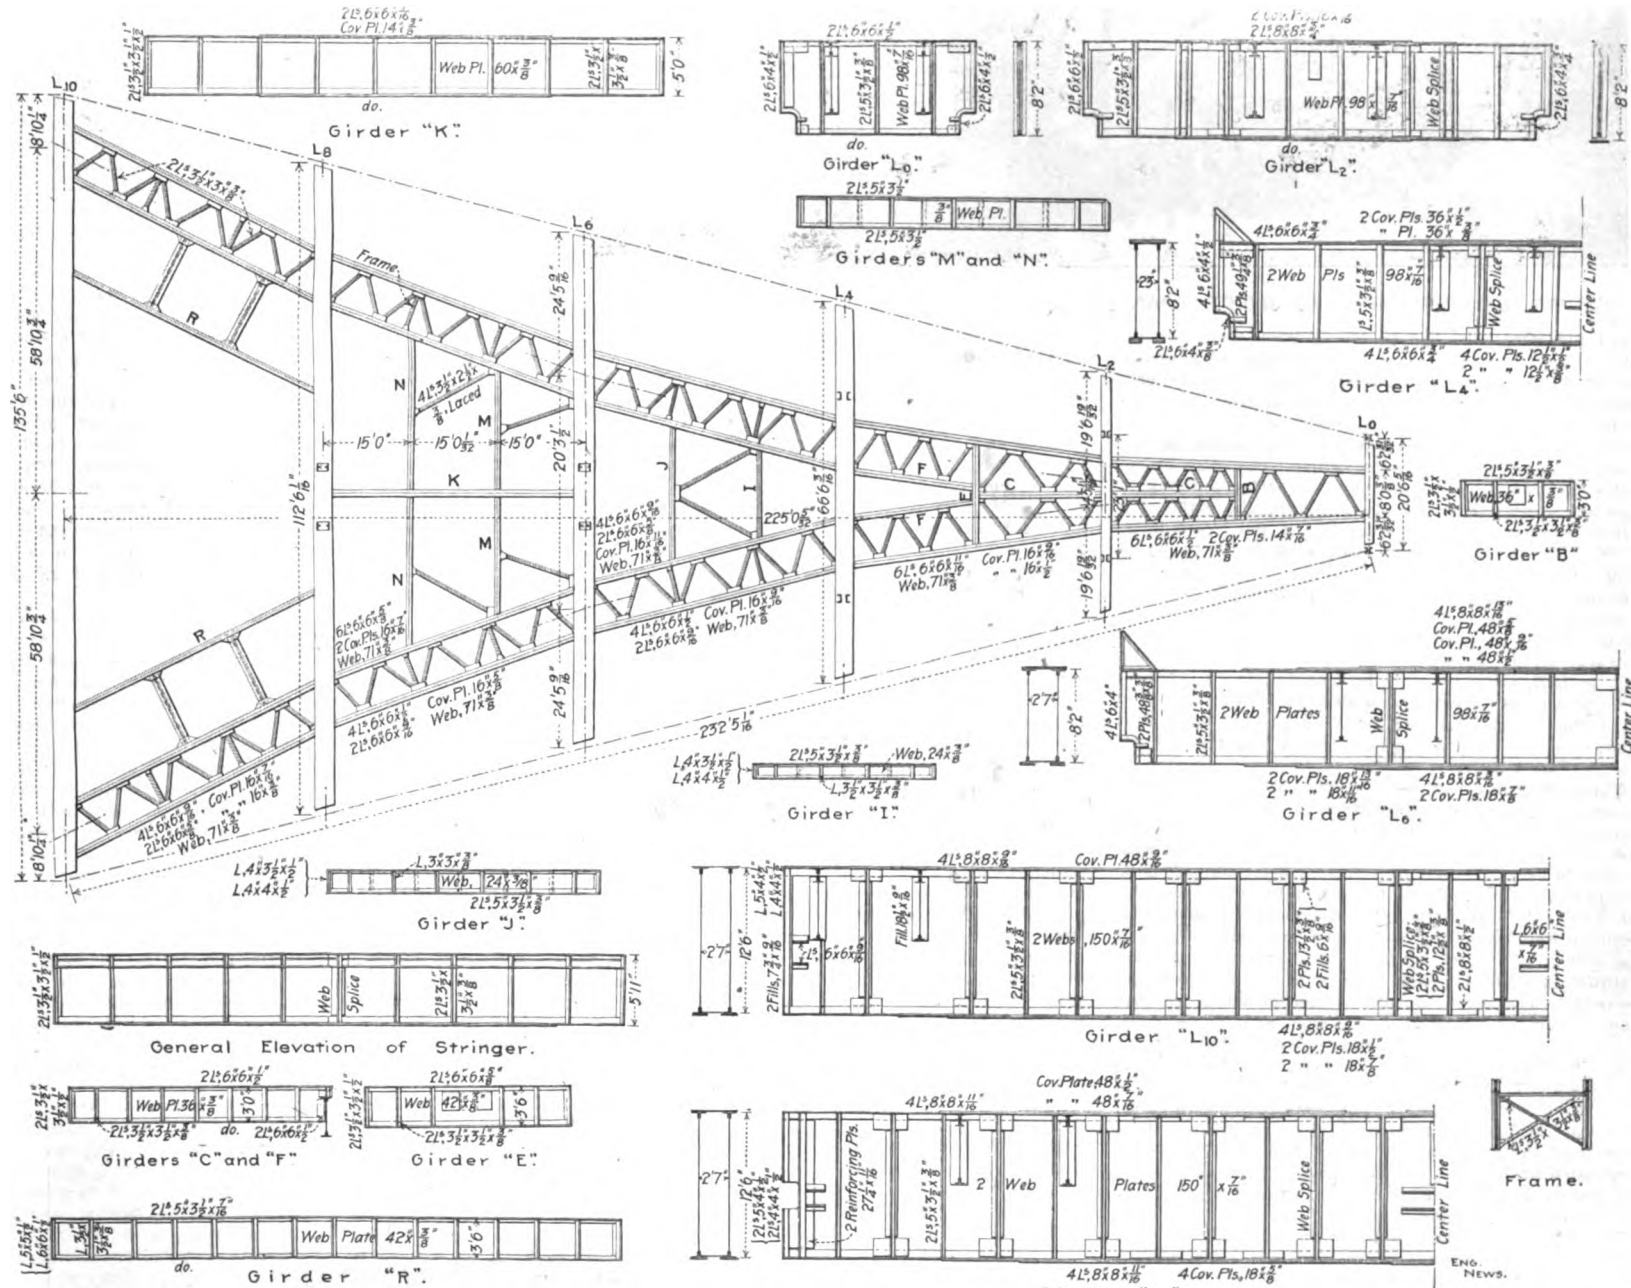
DETAILS OF FLOOR SYSTEM FOR SPREAD SPAN.
